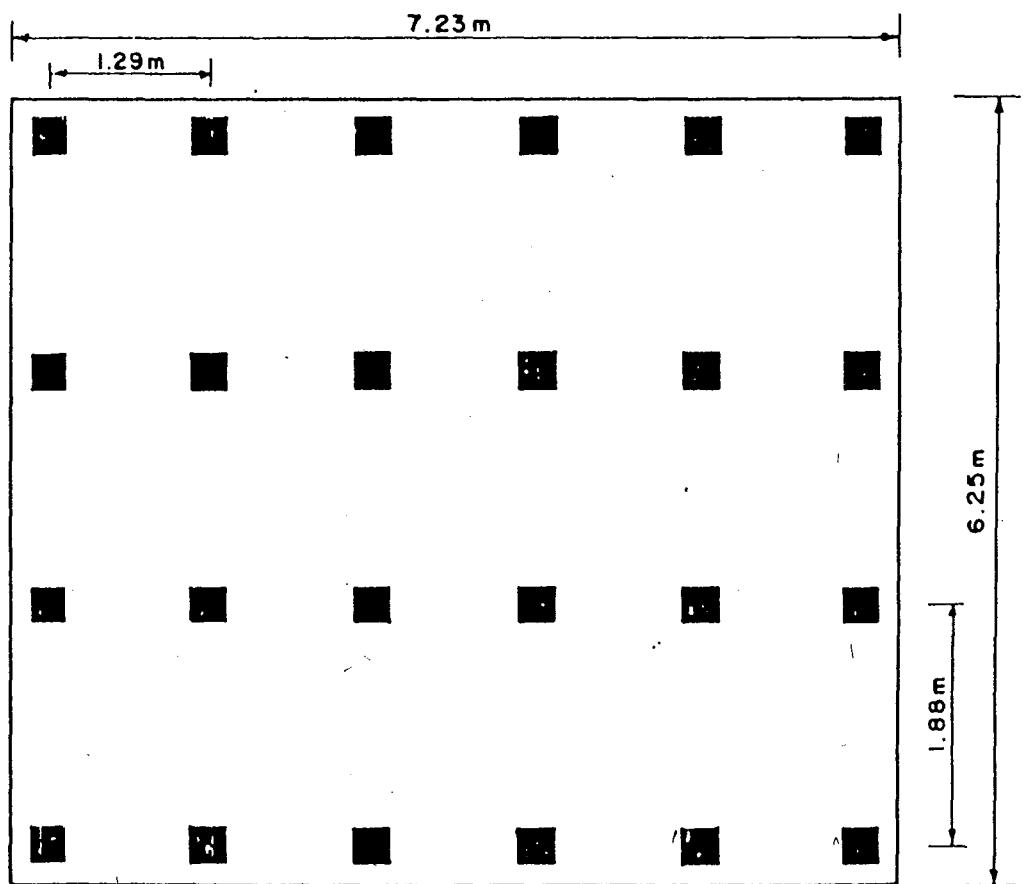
Pile arrangements in ex. 5 Scale 1:64
